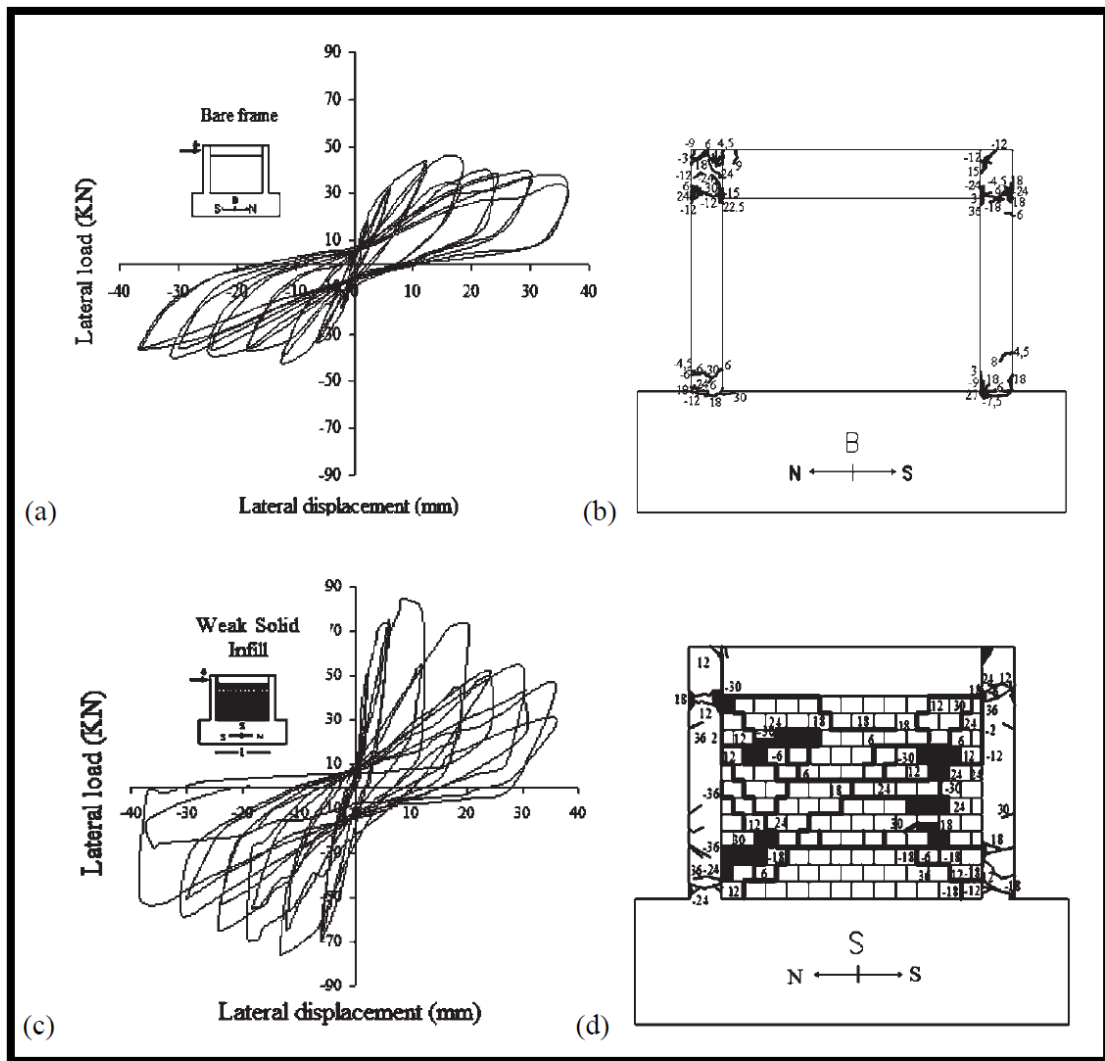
Failure mechanism 5 (Mehrabi & Shing, 2003)
